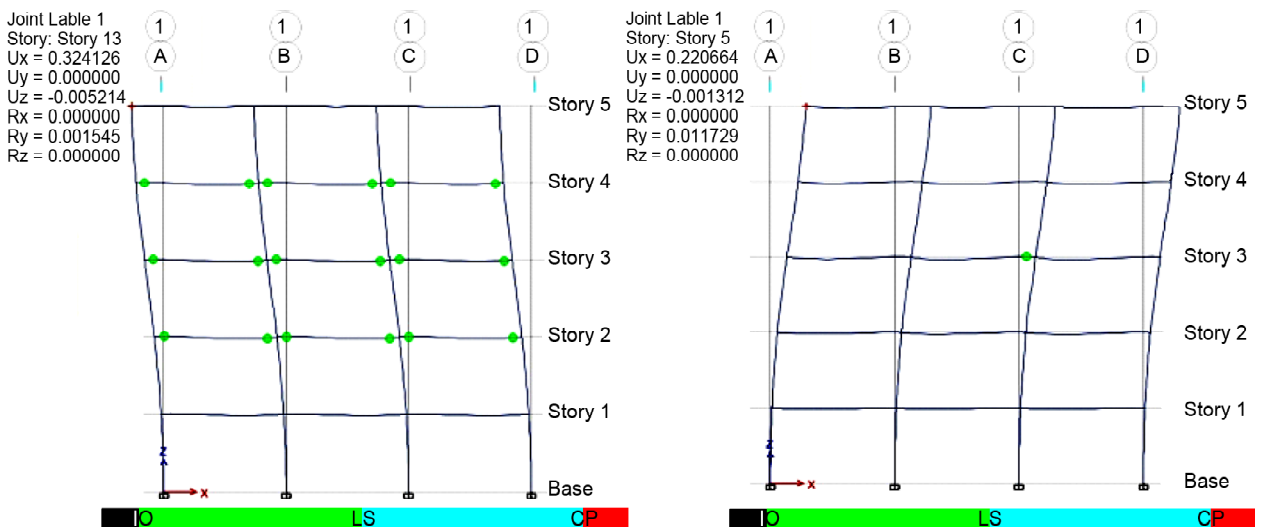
The first and last plastic joint in the structure by modeling the panel zone using the traditional scissors method.
